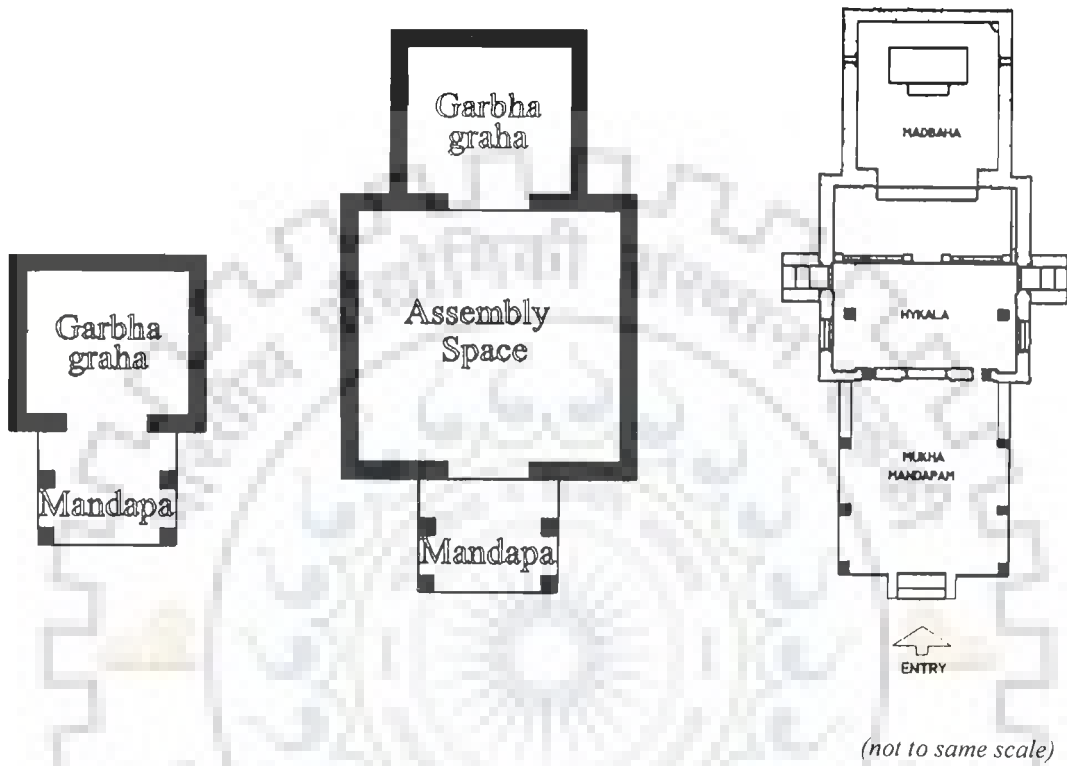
Plans of a typical Hindu temple, Jain *palli* and Thiruvithamcode church
